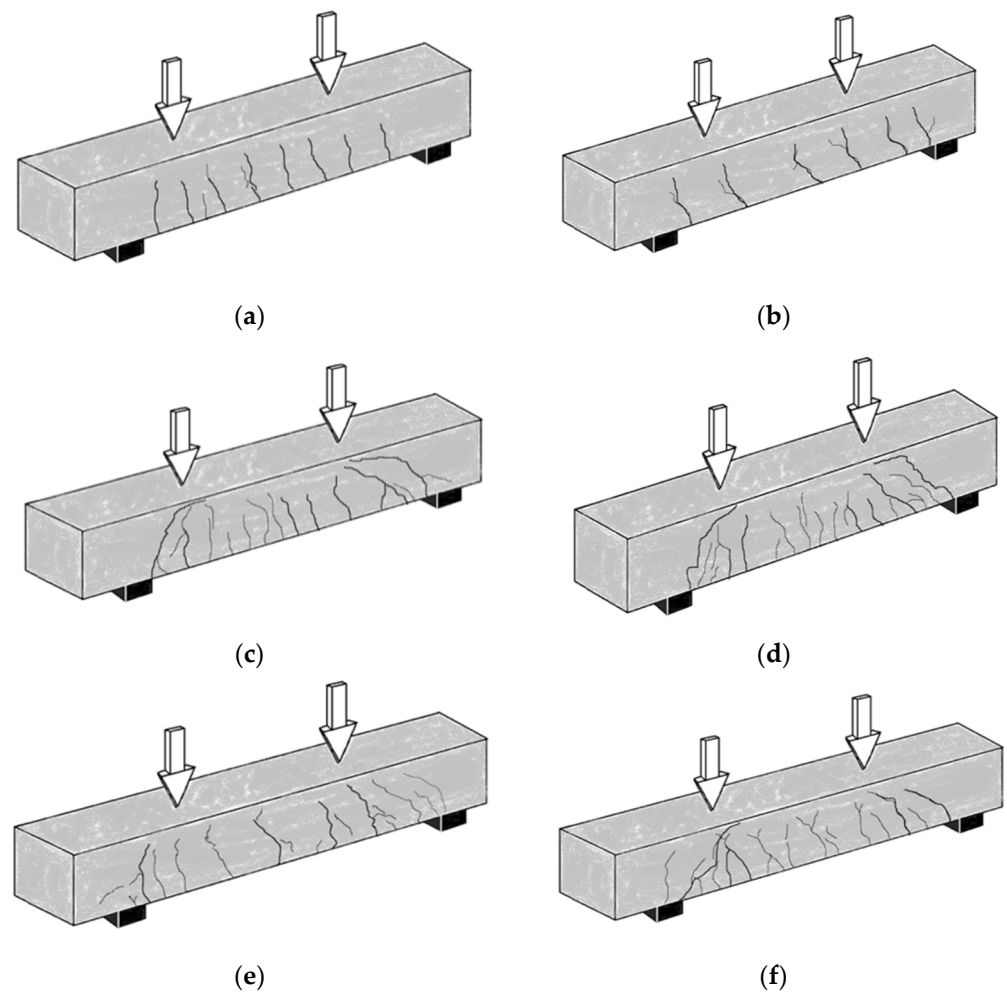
Crack development in tested concrete beams: (a) ABST-1; (b) ABST-2; (c) ABGF-1; (d) ABGF-2; (e) ABBF-1; (f) ABBF-2.
